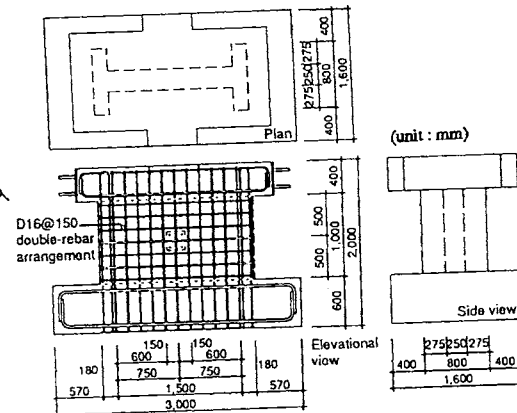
Configuration of "P1" specimens for pull-out test under an in-plane force
